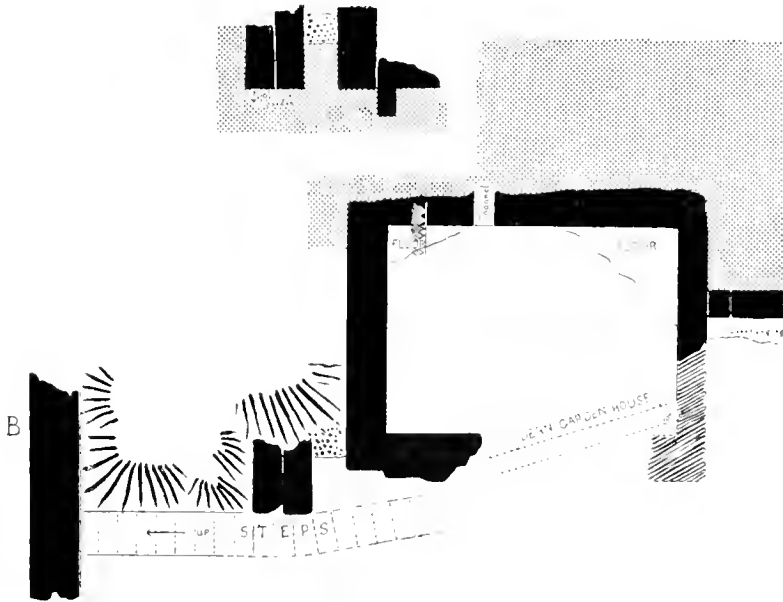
PLAN OF WALLS, TO THE EAST OF THE UPPER BATHS.
